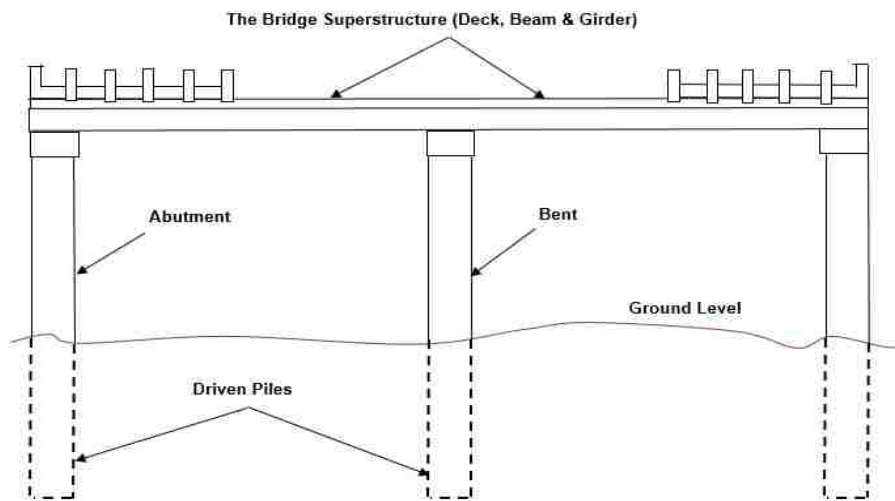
Sketch Shows Basic Components of a Timber Bridge
